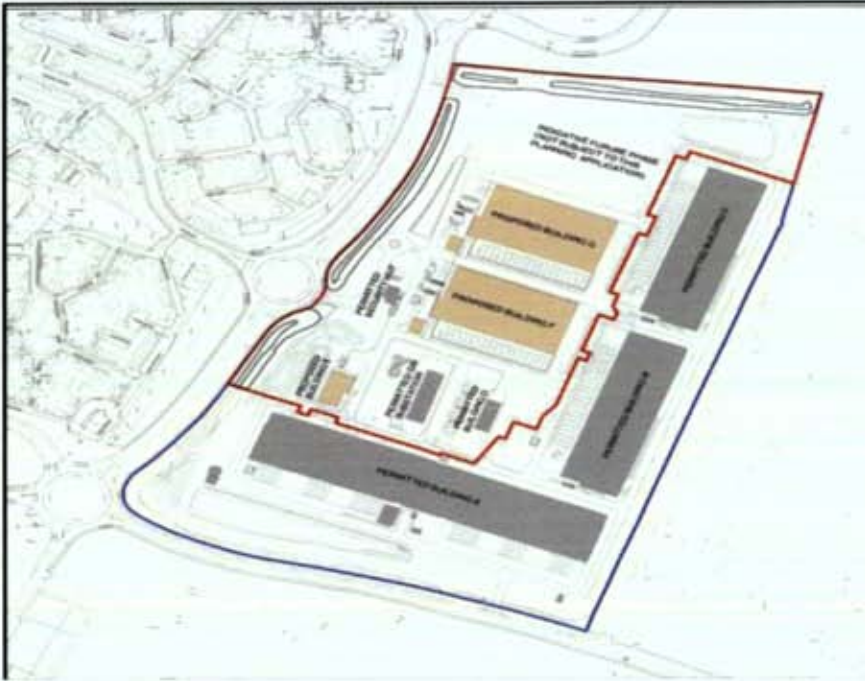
Current indicative masterplan for the site (Source: Henry J. Lyons November 2022)
